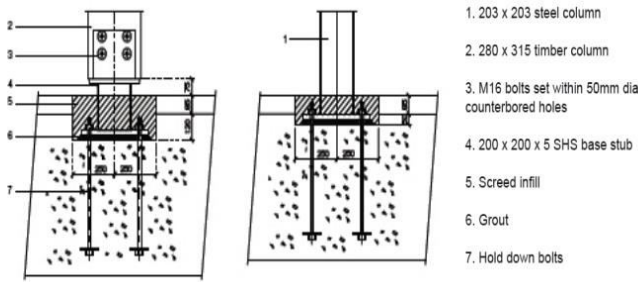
Typical base detail for wood (left) and steel (right) section
